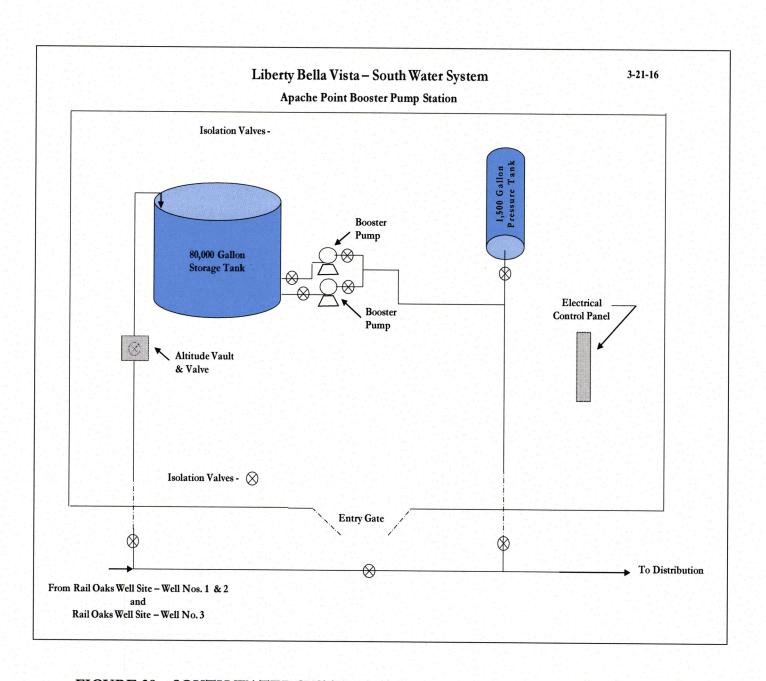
SOUTH WATER SYSTEM APACHE POINT BOOSTER PUMP STATION
